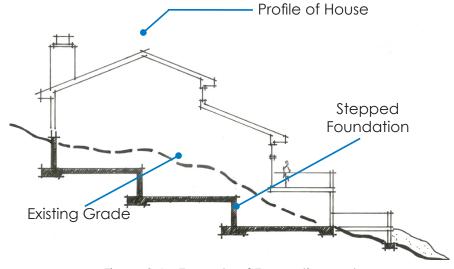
Example of Excavation and Reduction of Apparent Mass, Bulk, and Scale
